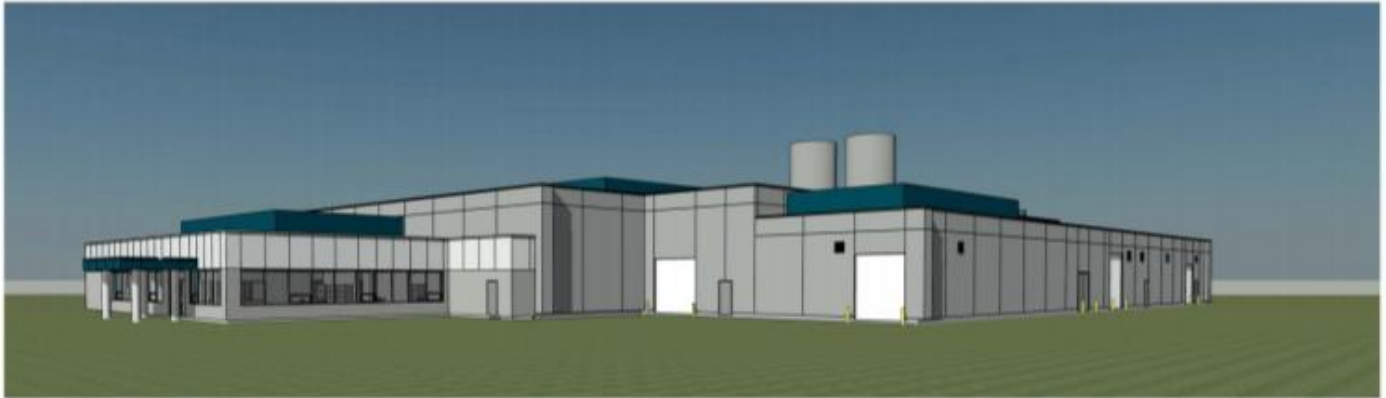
Architectural Rendering of the New Drinking Water Treatment Plant
